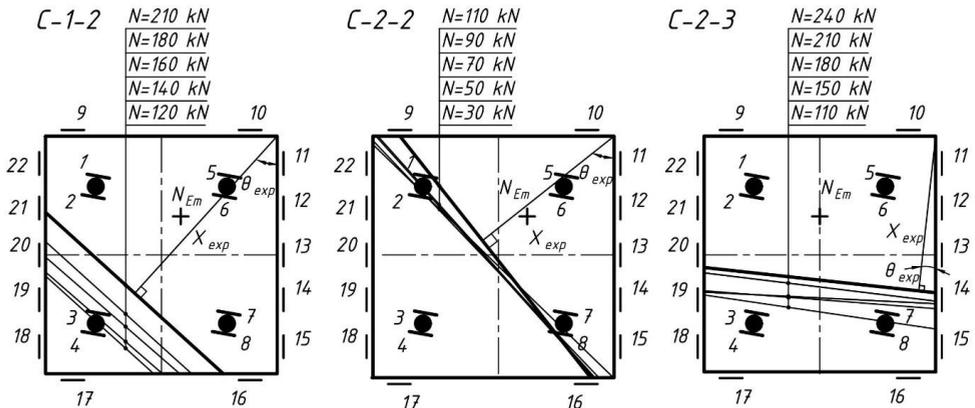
Changing the position of neutral axis and forms of the compressed concrete area in the cross-section of test columns
